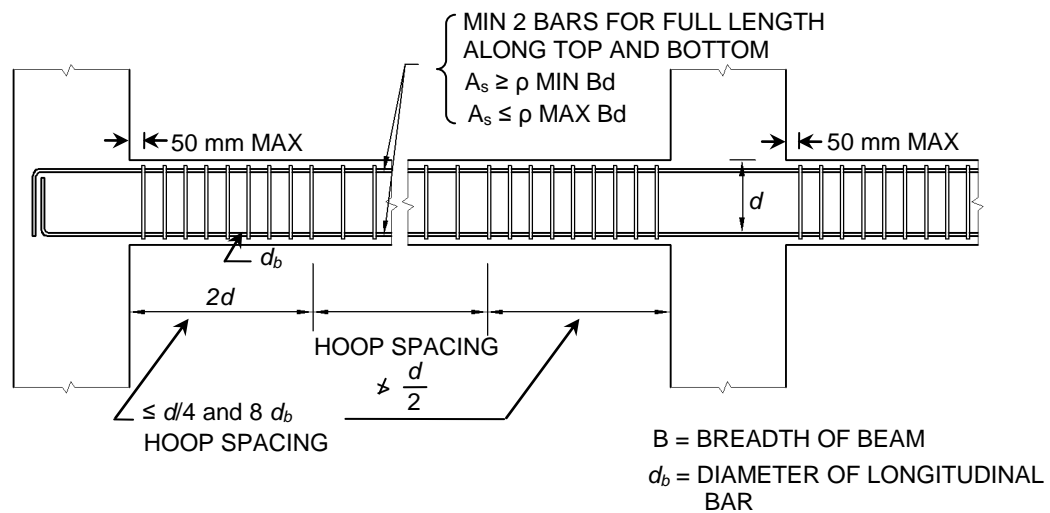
DETAILS OF TRANSVERSE REINFORCEMENT IN BEAMS
